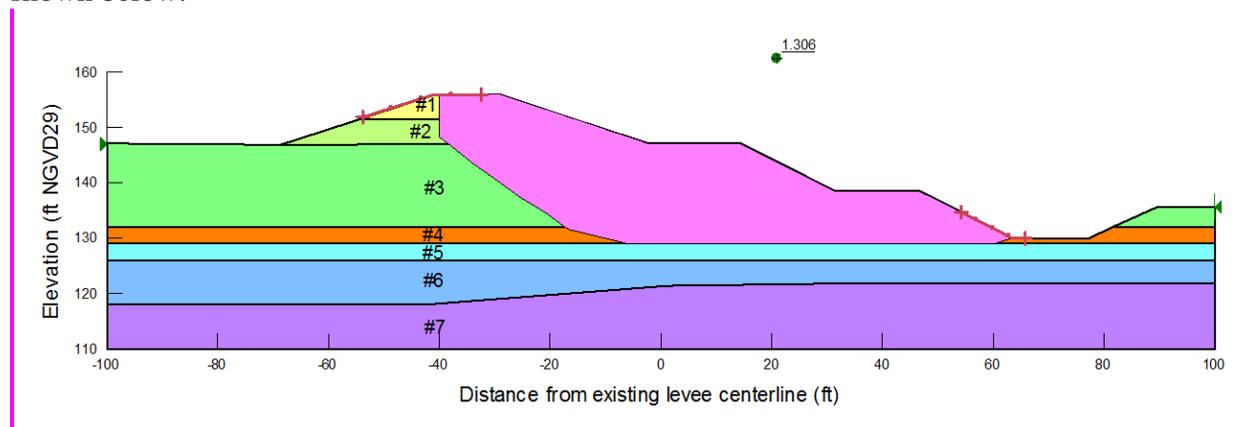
SHOWS THE EXISTING LEVEE AND THE PROPOSED 35-FT LEVEE SETBACK WITH EXCAVATED 1V:2H BANK SLOPES AND LEVEE, END-OF-CONSTRUCTION CONDITION
